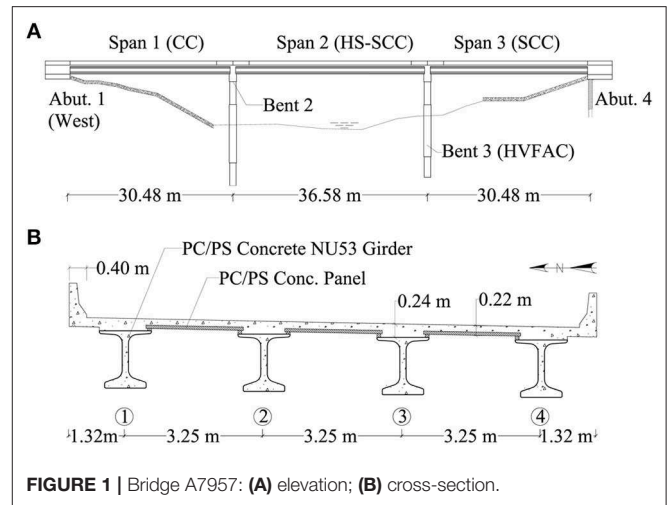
| Bridge A7957: (A) elevation; (B) cross-section.
